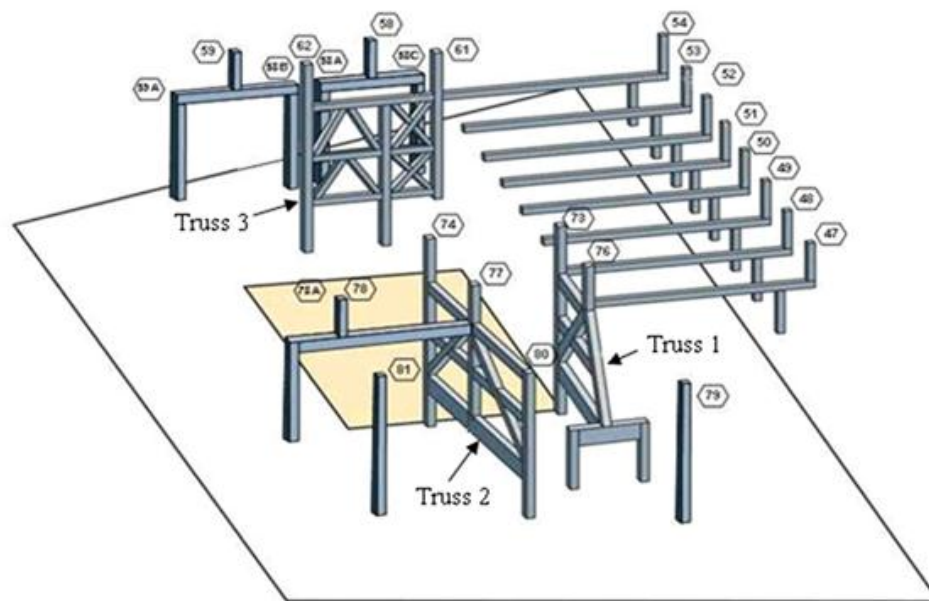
3D schematic view of transfer trusses and girders between Floors 5 and 7 [18].
